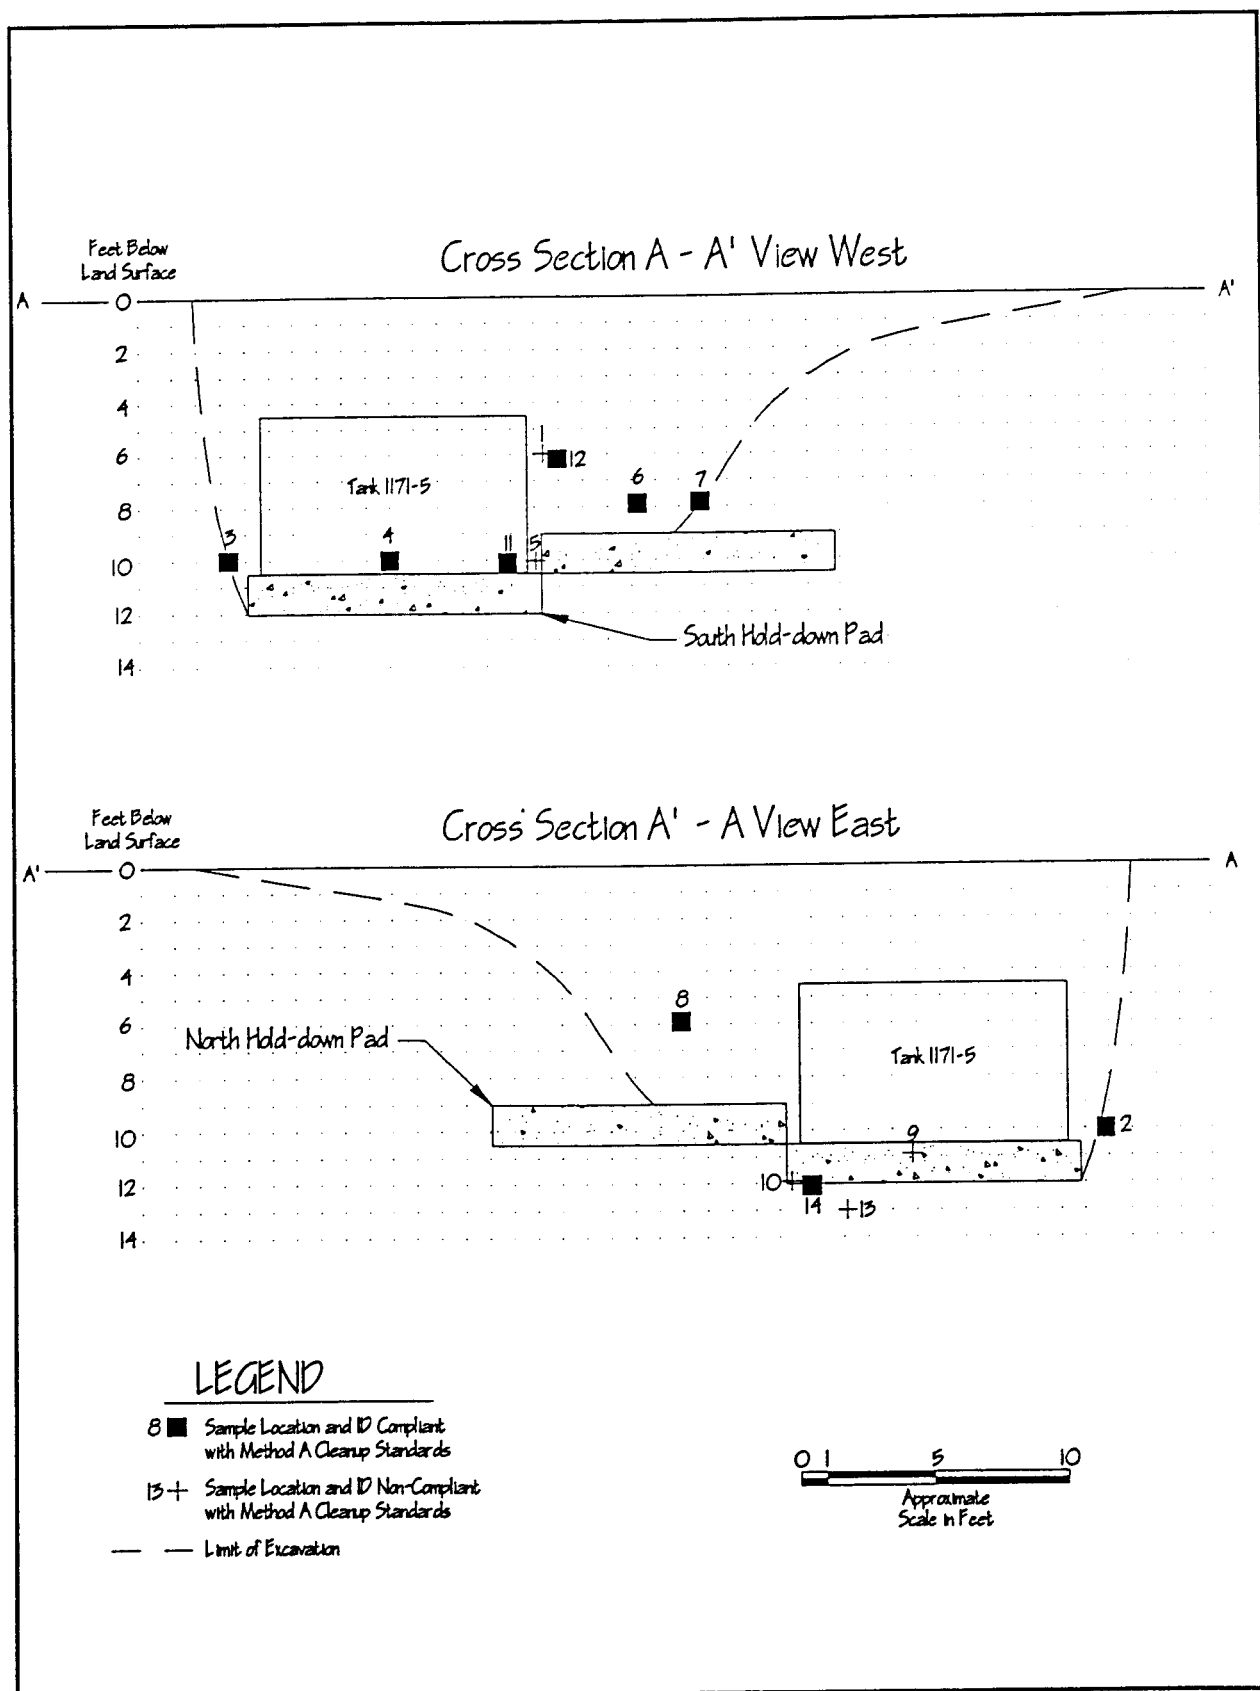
Cross Sectional Views of the 1171-5 UST Showing Sample Locations and Limits of Excavation.
